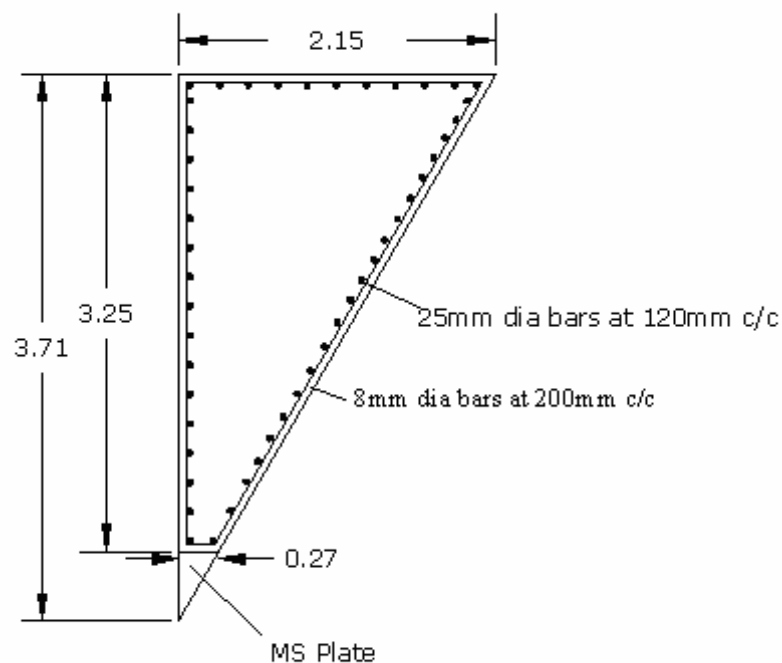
REINFORCEMENT DETAILS OF WELL CURB
